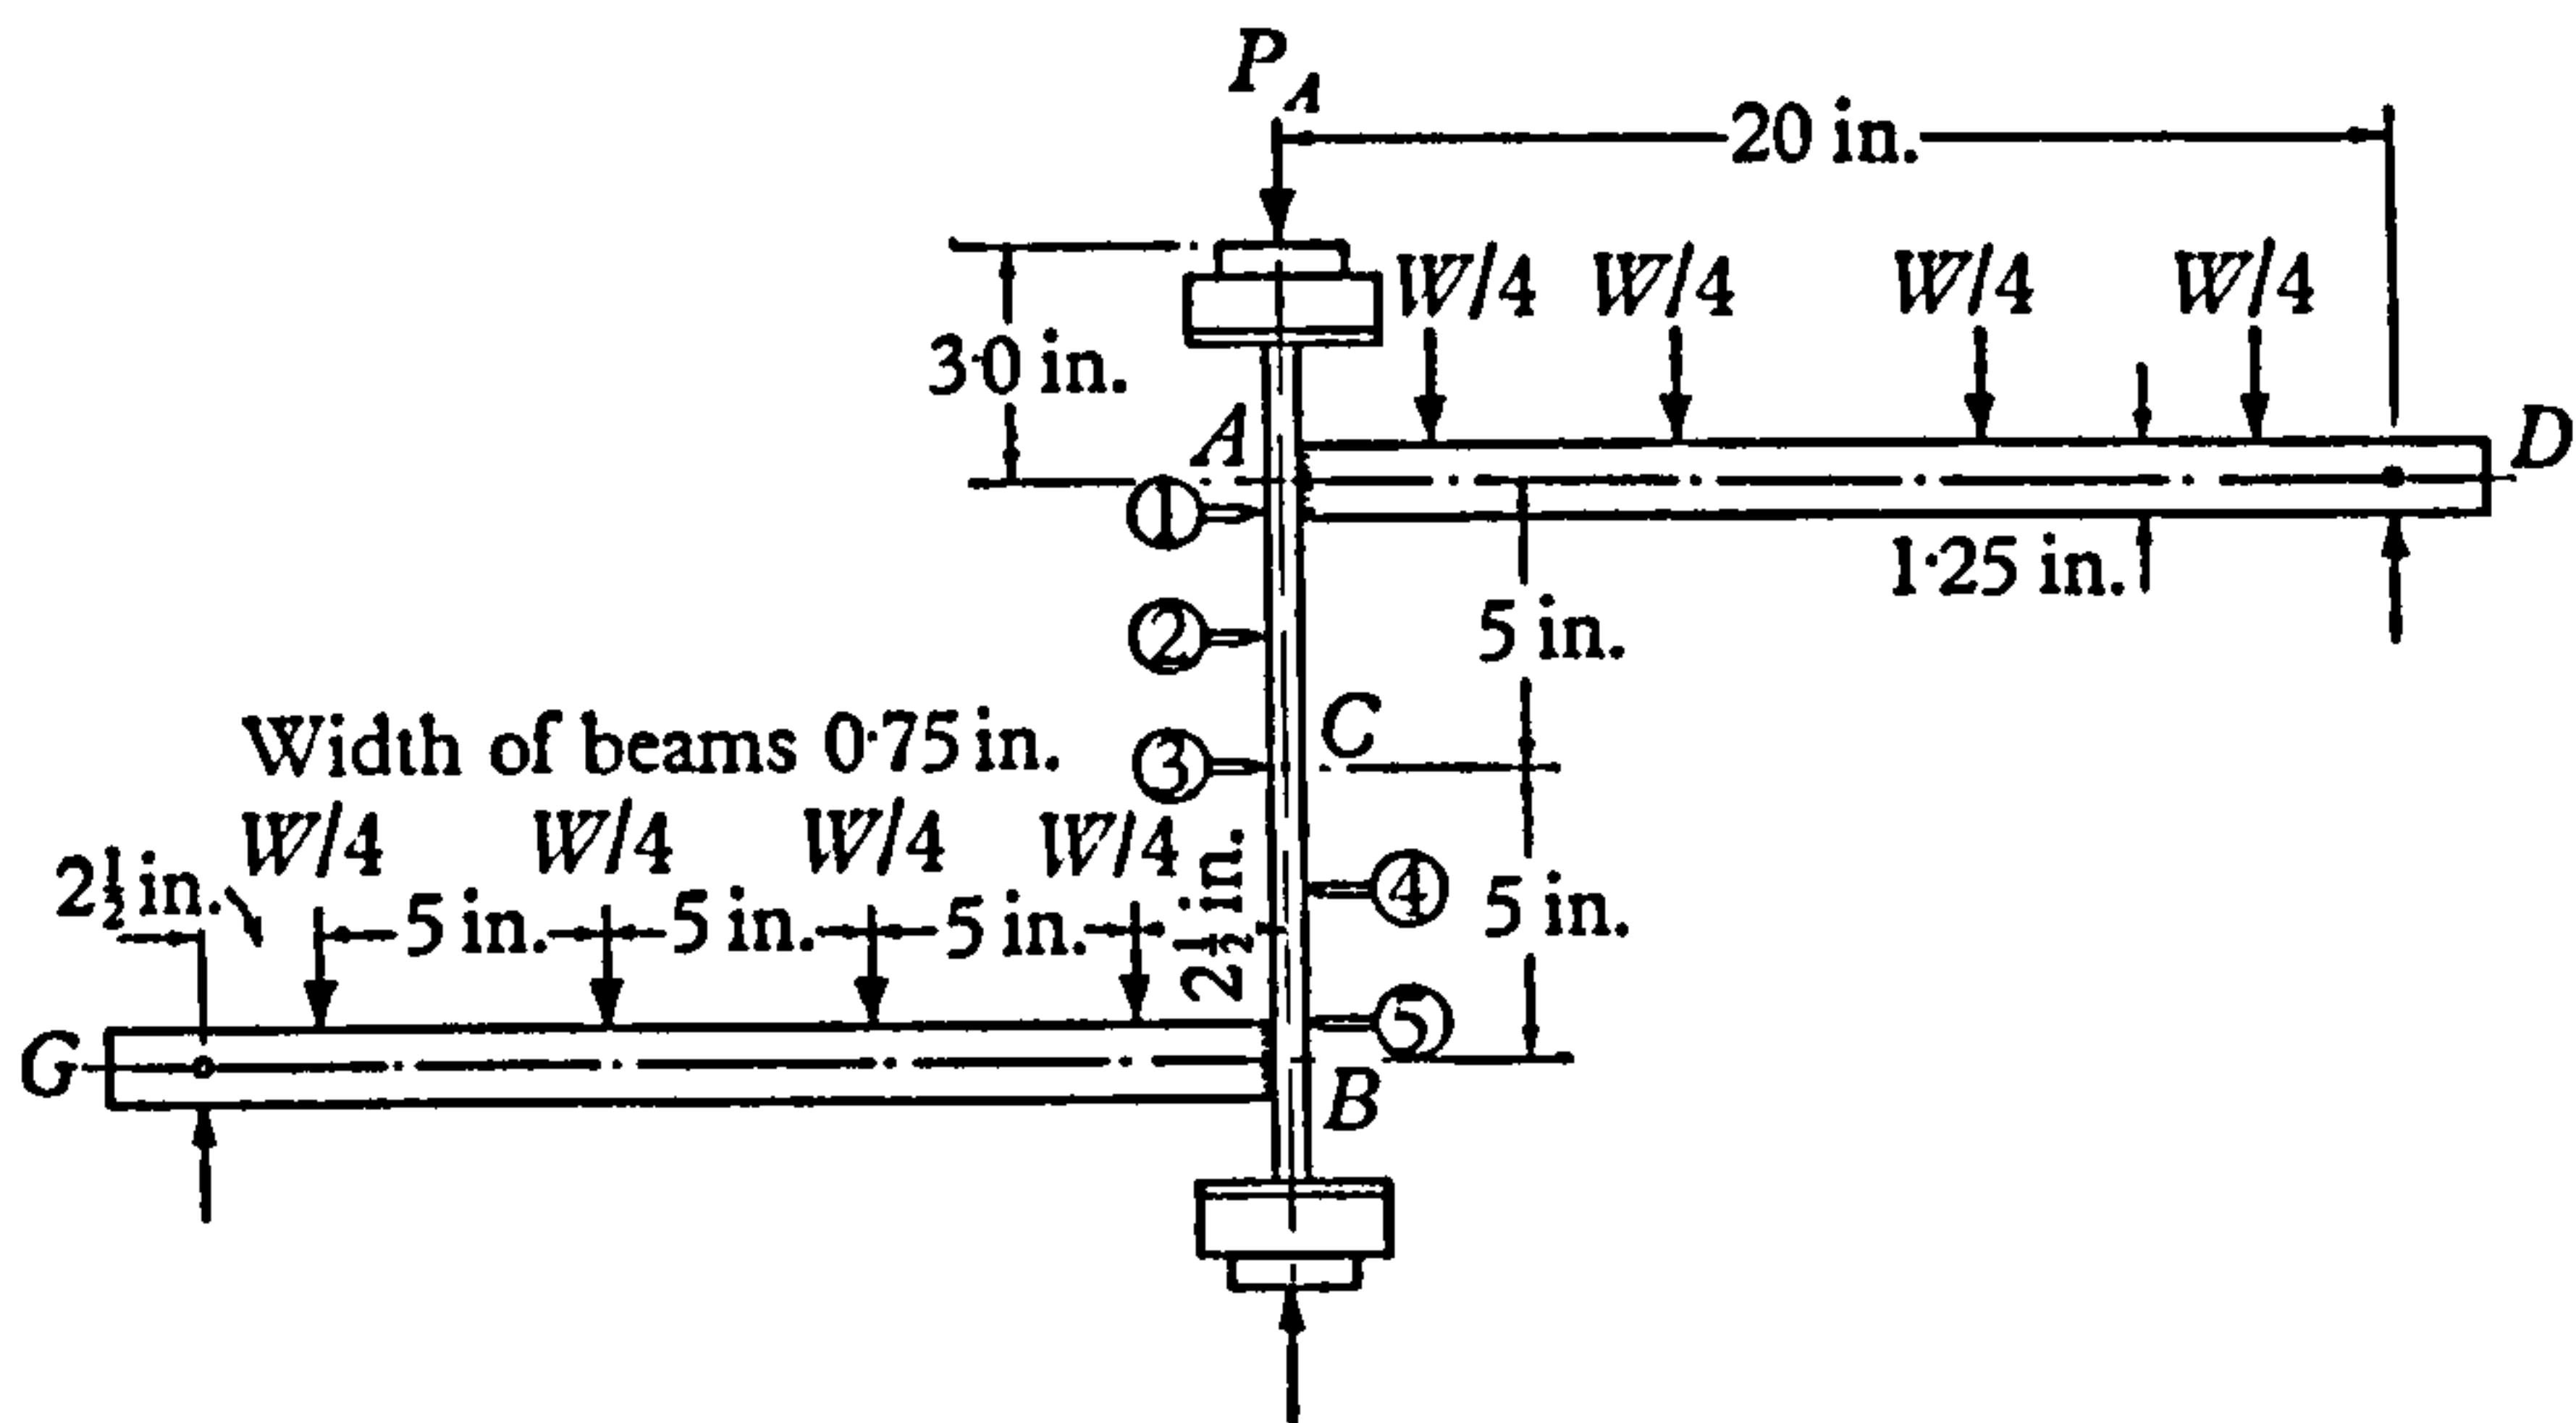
Beam-column with rigid joints in Baker's small scale plane sub-frame model [2-28]
